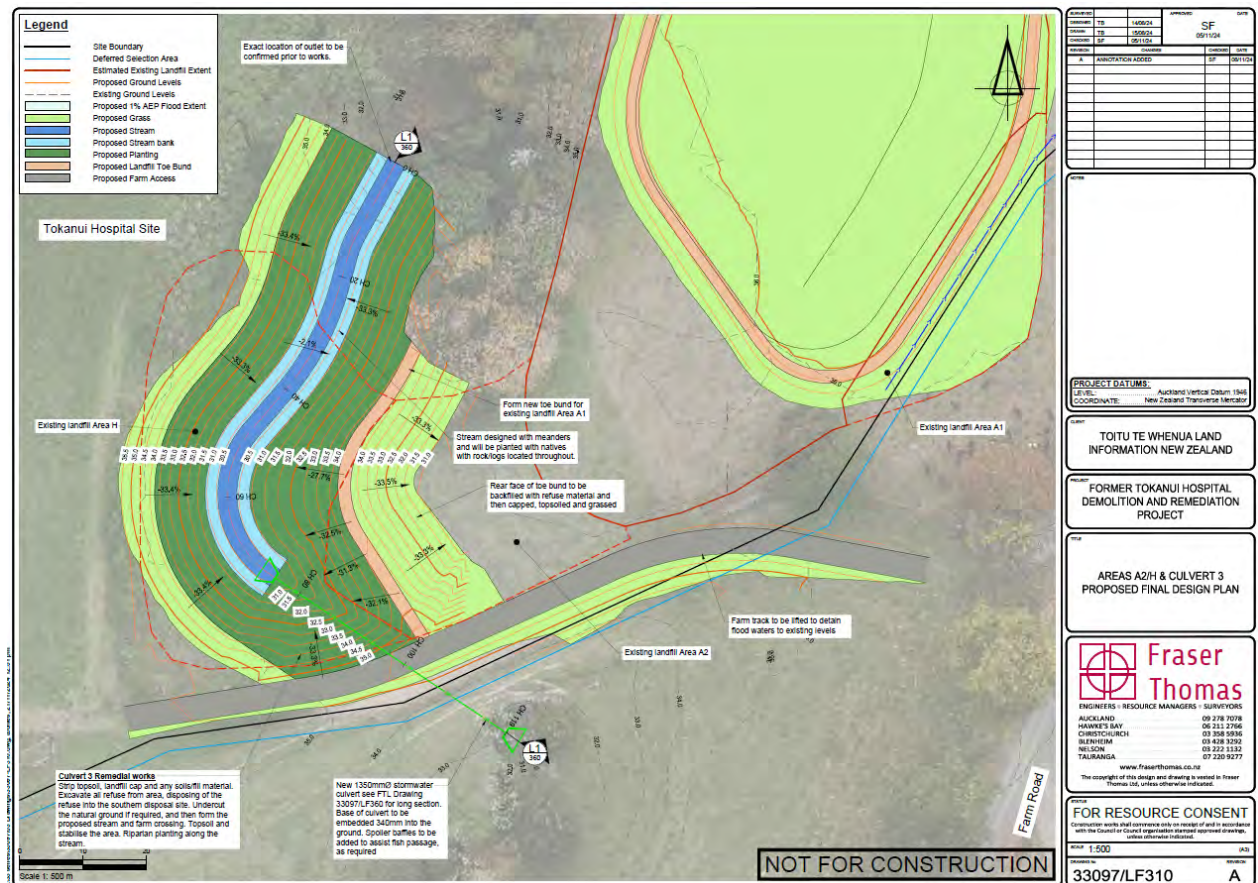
Areas A2H & Culvert 3 – Proposed Final Design Plan
